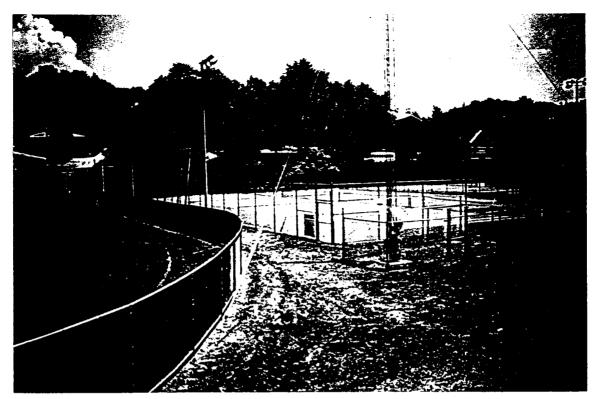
Proposed site area showing ASU Lackey Baseball Field and tennis courts.
